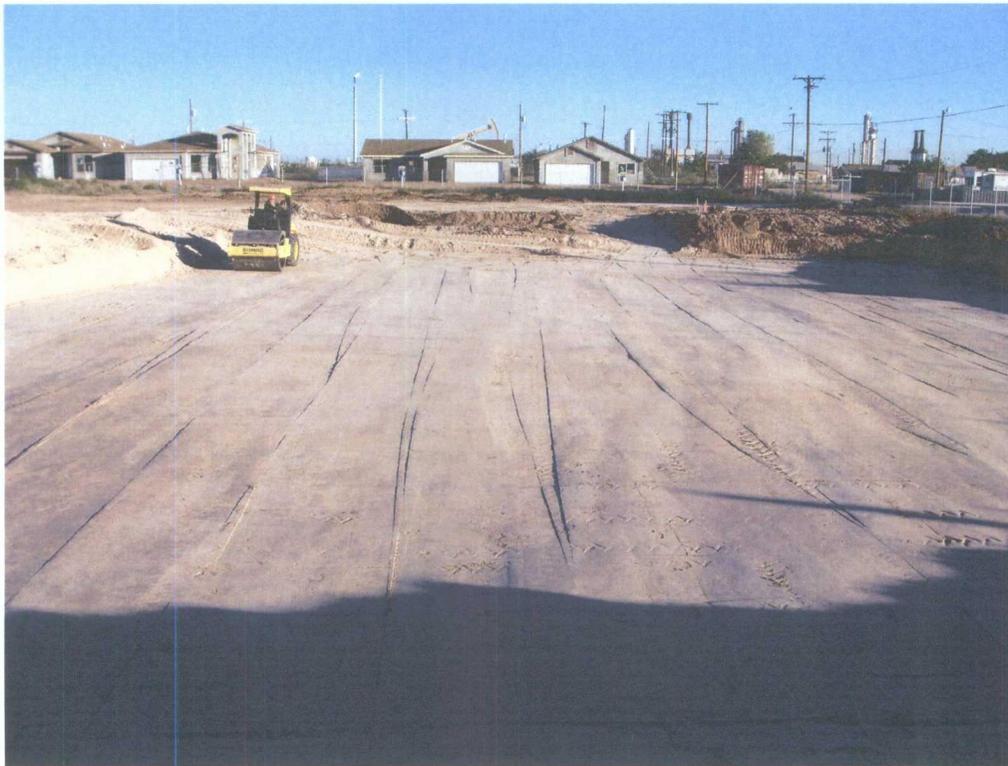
Crusher Fines Placement in Bottom of Excavation
